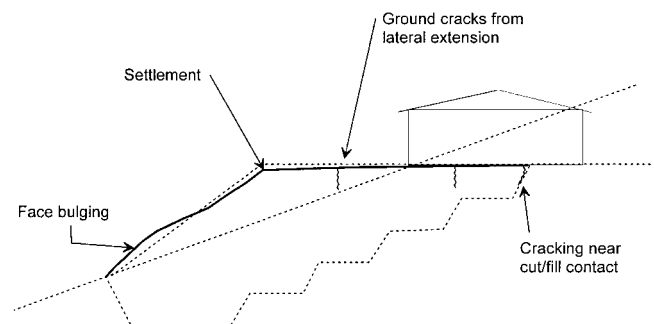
Schematic Showing Typical Damage to Fill Slope
